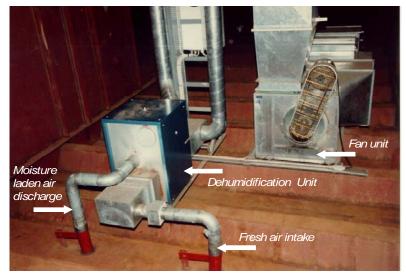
a dehumidification plant in the box girder of the Faroe Bridges, Denmark
